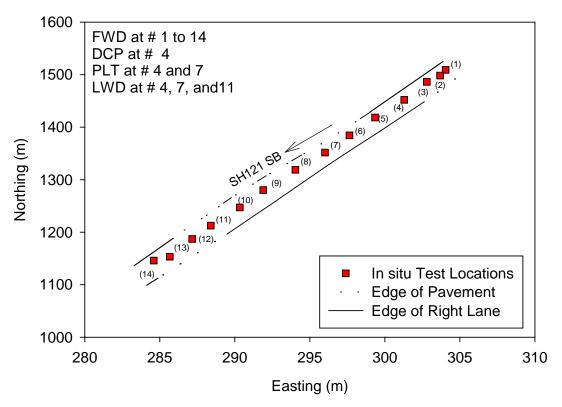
Test section plan layout with RTK GPS test locations SH 121 Fort Worth, Texas
